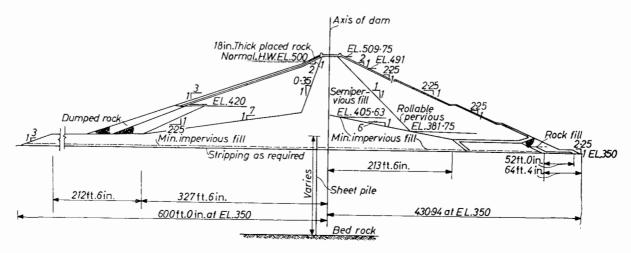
Typical section—Maithon Earth Dam (DVC)
